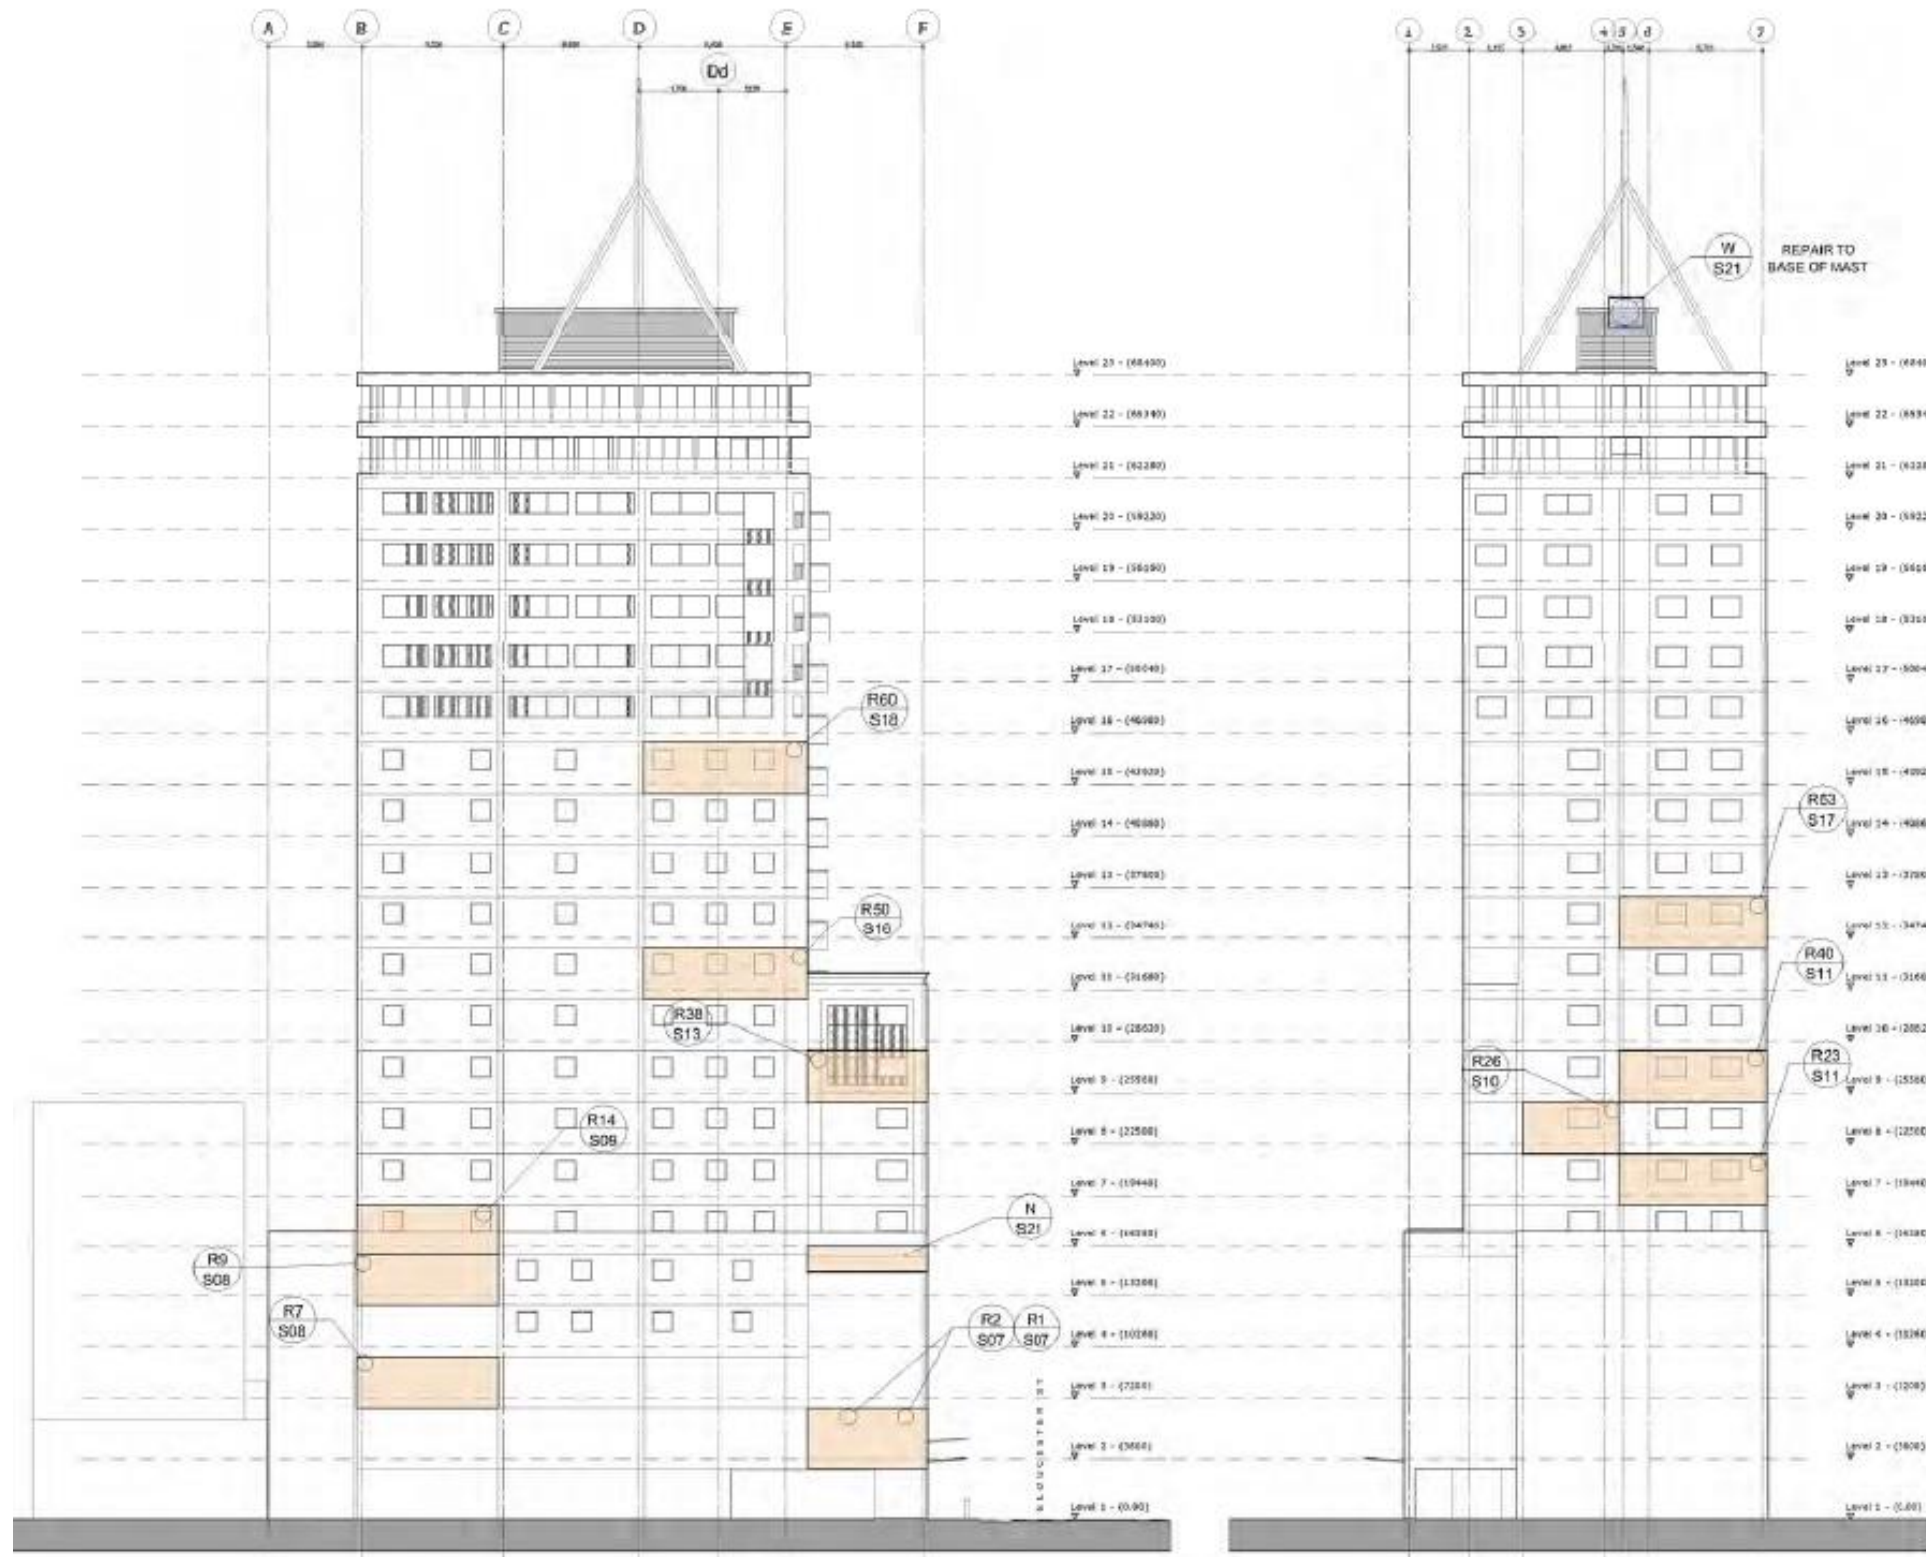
Exterior Cladding damage on East elevation and South elevation
